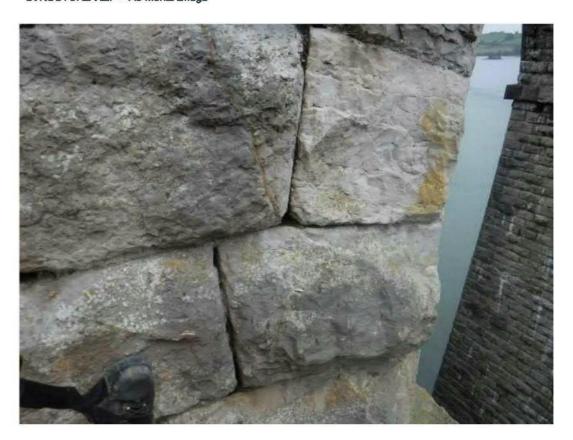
primary deck element – several small areas of deep mortar loss to joints throughout the arches. Typical area around the east side, above south springer of arch 7 (span 7).
